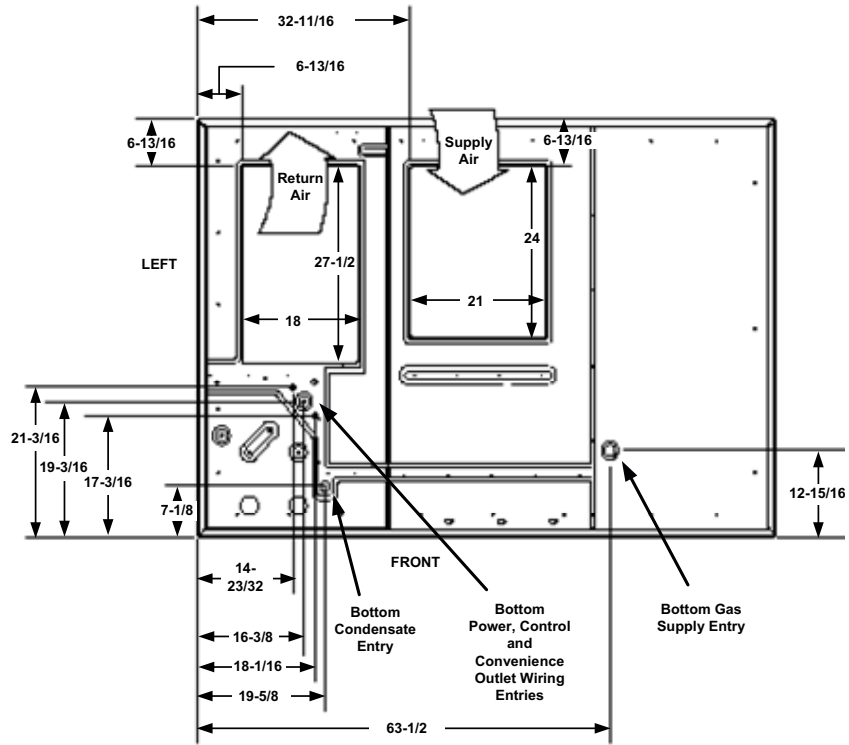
BOTTOM DUCT OPENINGS (FROM ABOVE)
